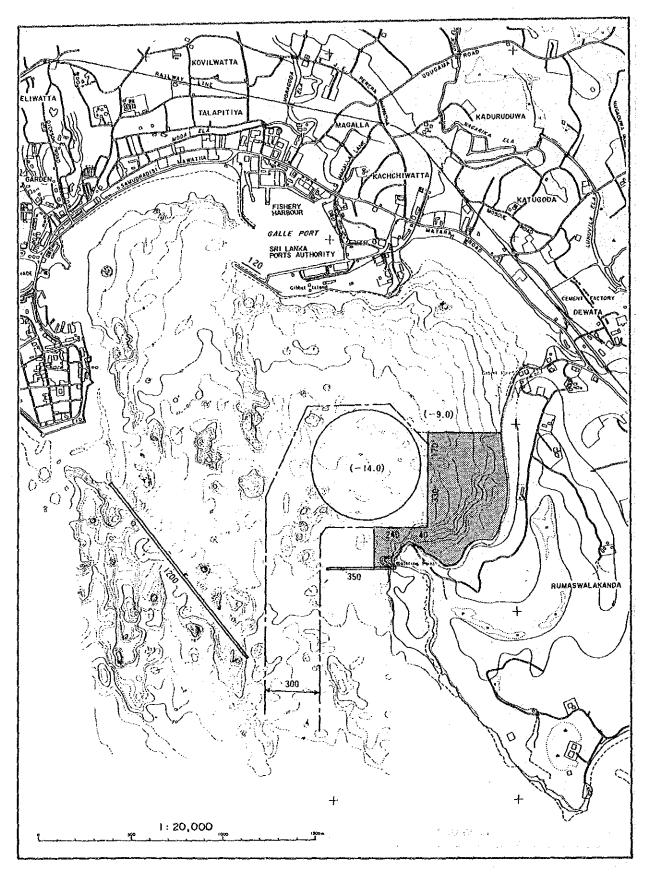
Short Term Development Plan (Alternative 2)
